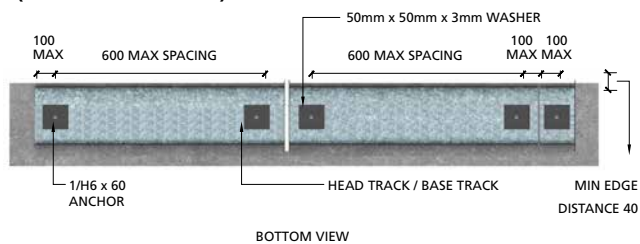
(A)B2: TRACK FIXING TO CONCRETE SUBSTRATE (TRACK WIDTH 150MM)
